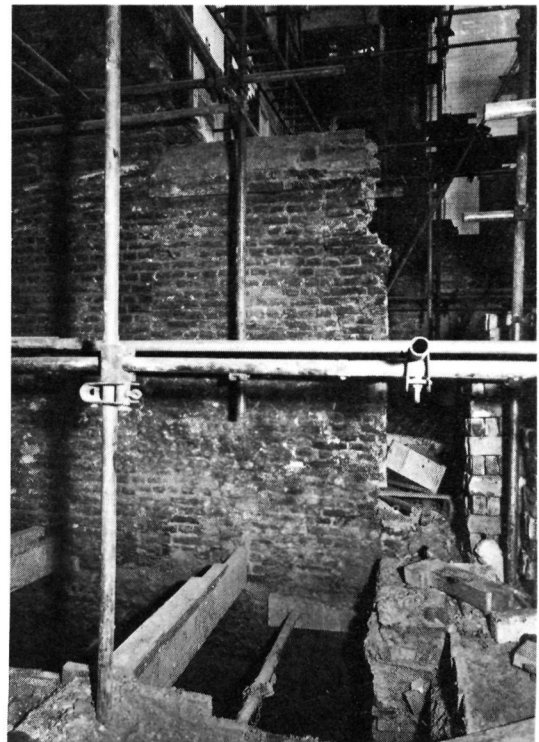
Whitehall: The Park wall, surviving length D.1 (Crown Copyright)
